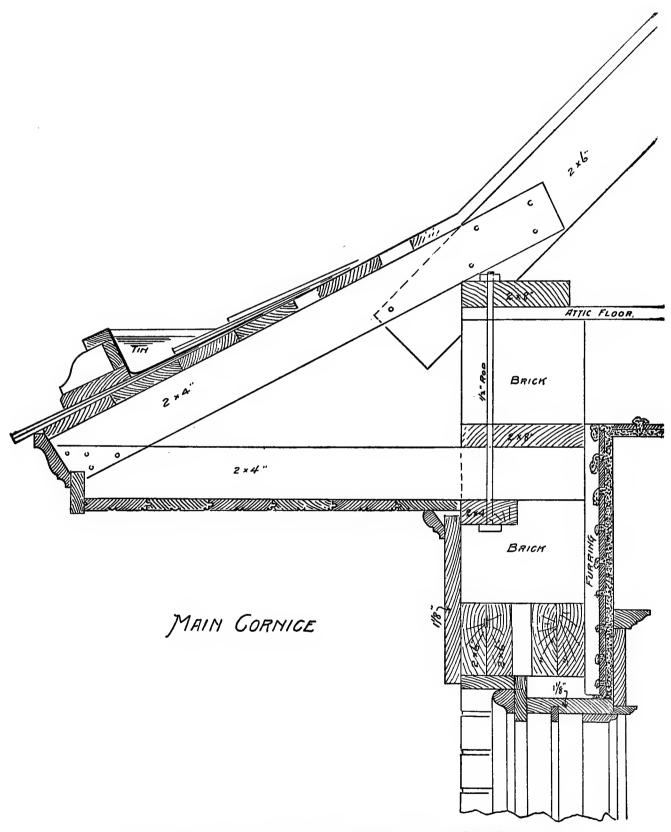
DETAIL OF MAIN CORNICE ON BRICK HOUSE
